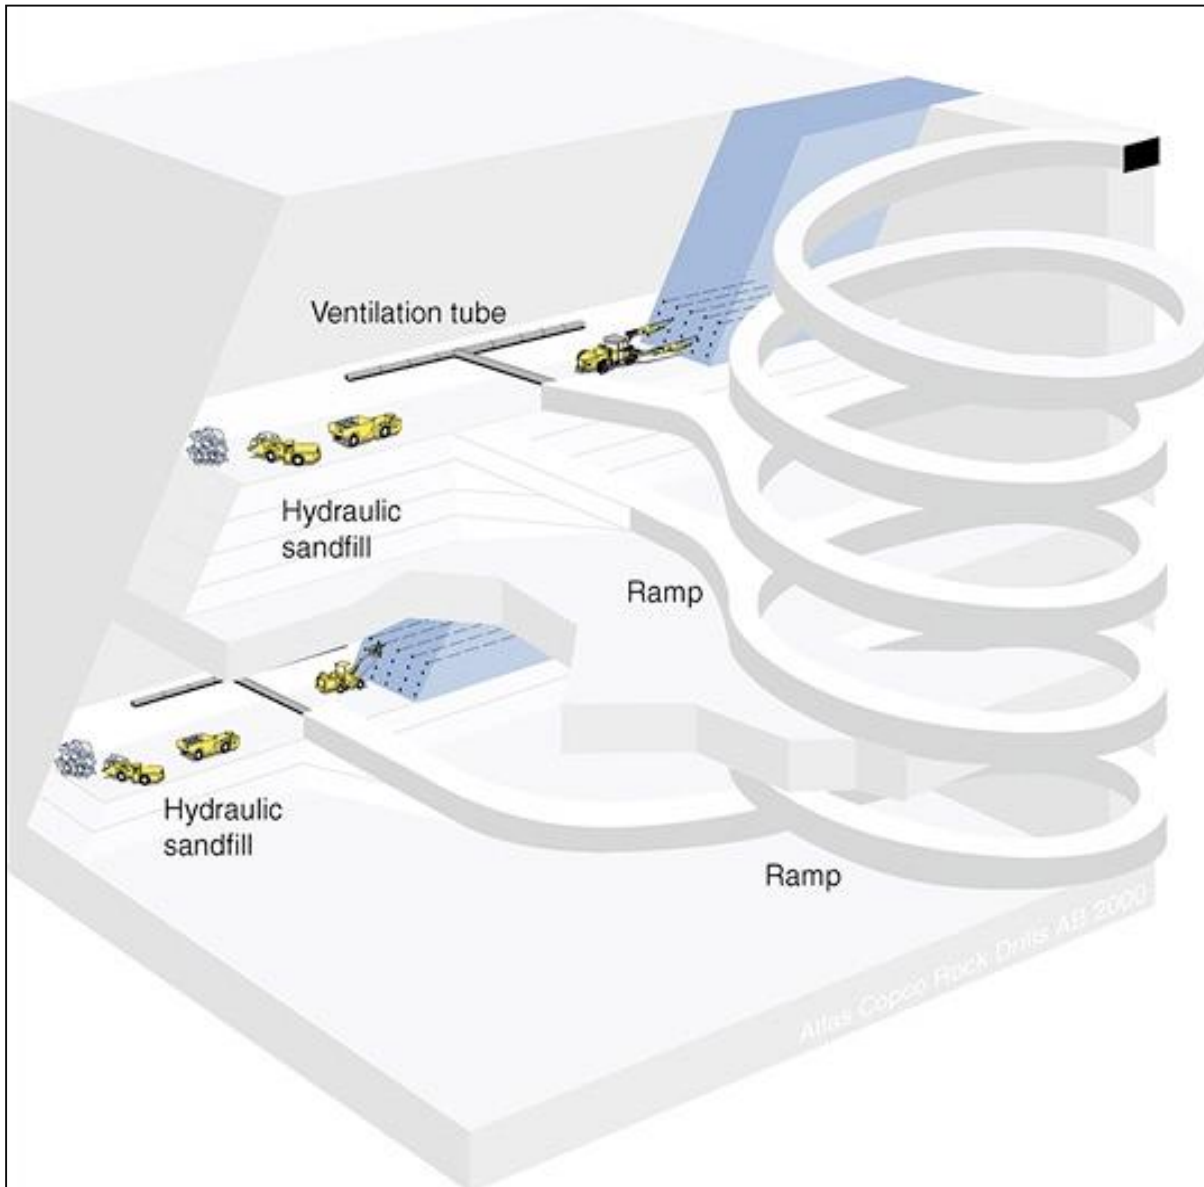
TYPICAL CUT AND FILL STOPE BLOCK
